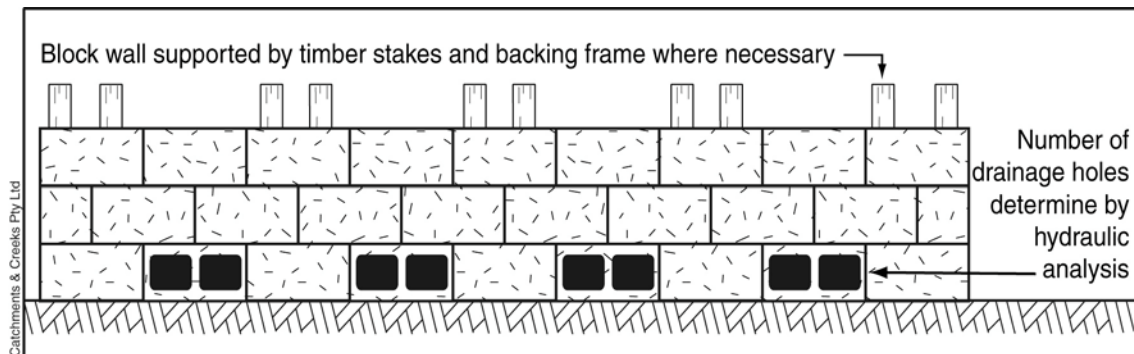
Typical layout of block wall (front view without aggregate filter shown)
